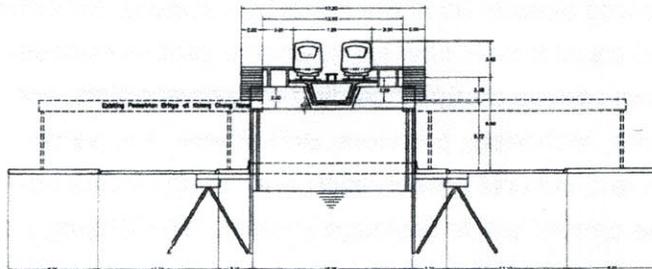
Canal tram elevation (Canal Tram Proposal)
